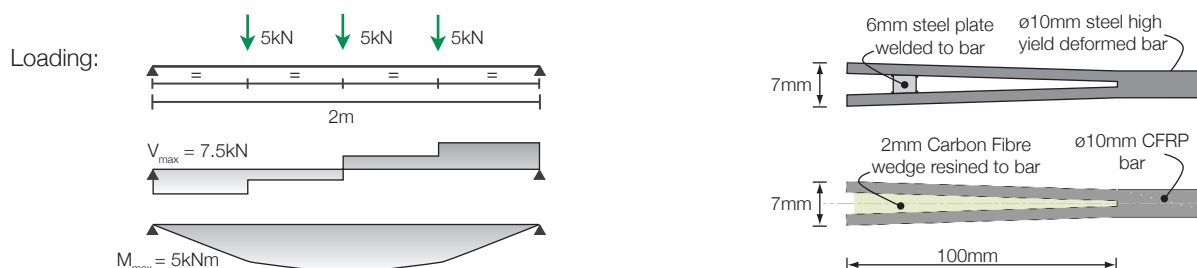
Loading envelope (l) and Splay dimensions (r).
